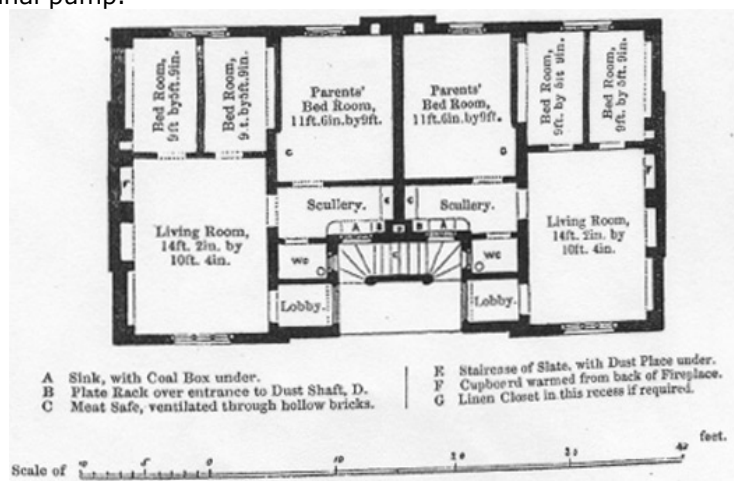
Henry Roberts - Model house plan, 1850, London
